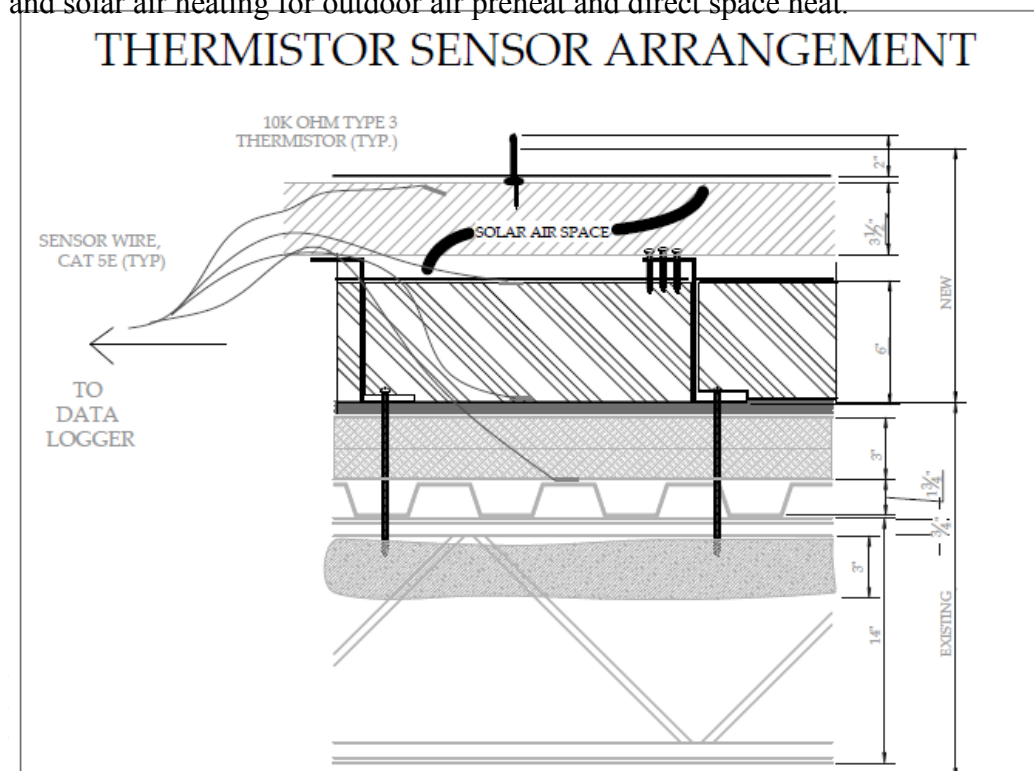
, 13 Thermistor Sensor Arrangement, Roof Section
